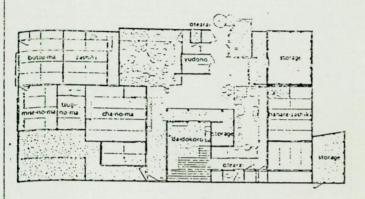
TYPICAL JAPANESE HOUSE PLAN.
